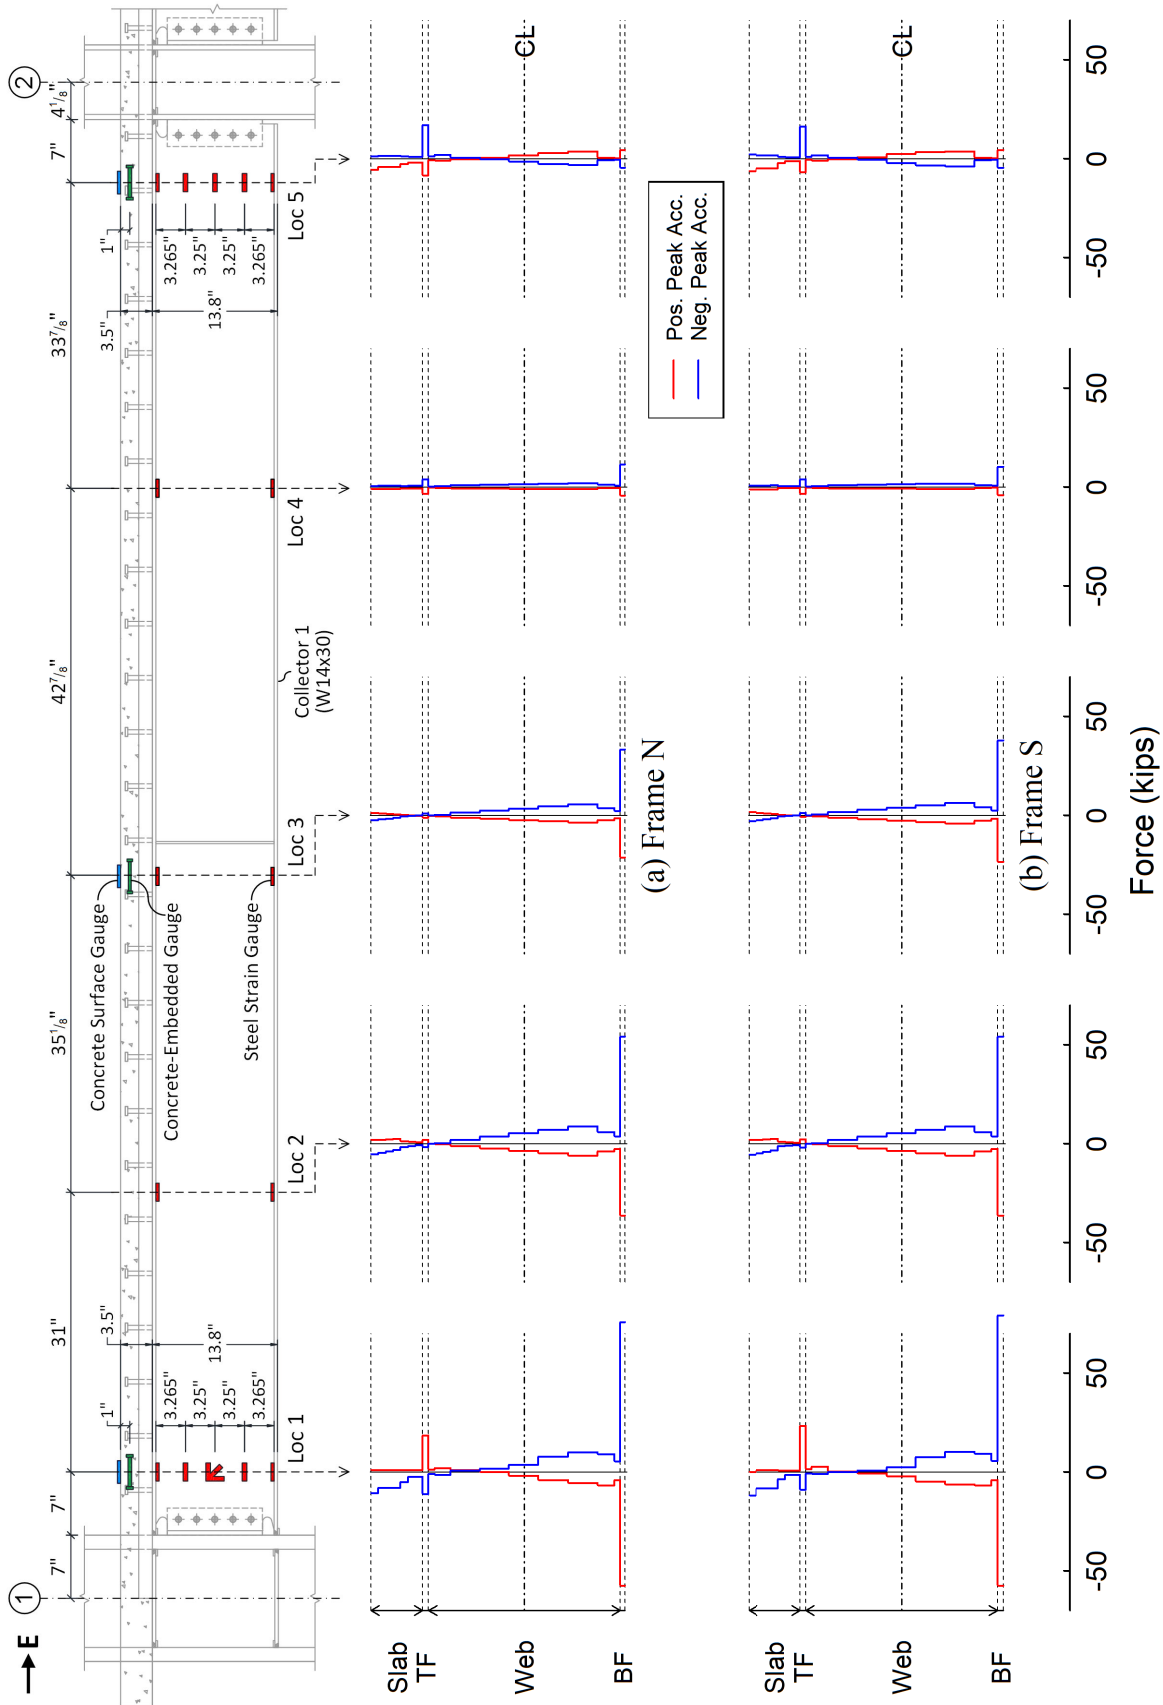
Test 1-3: Fiber Section Stress Profiles near Collector-to-Column Connections (2<sup>nd</sup> Floor)
